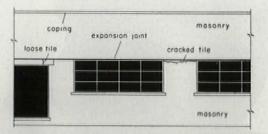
Movement above door head cracks the joint above door jambs, also the tile between windows.
